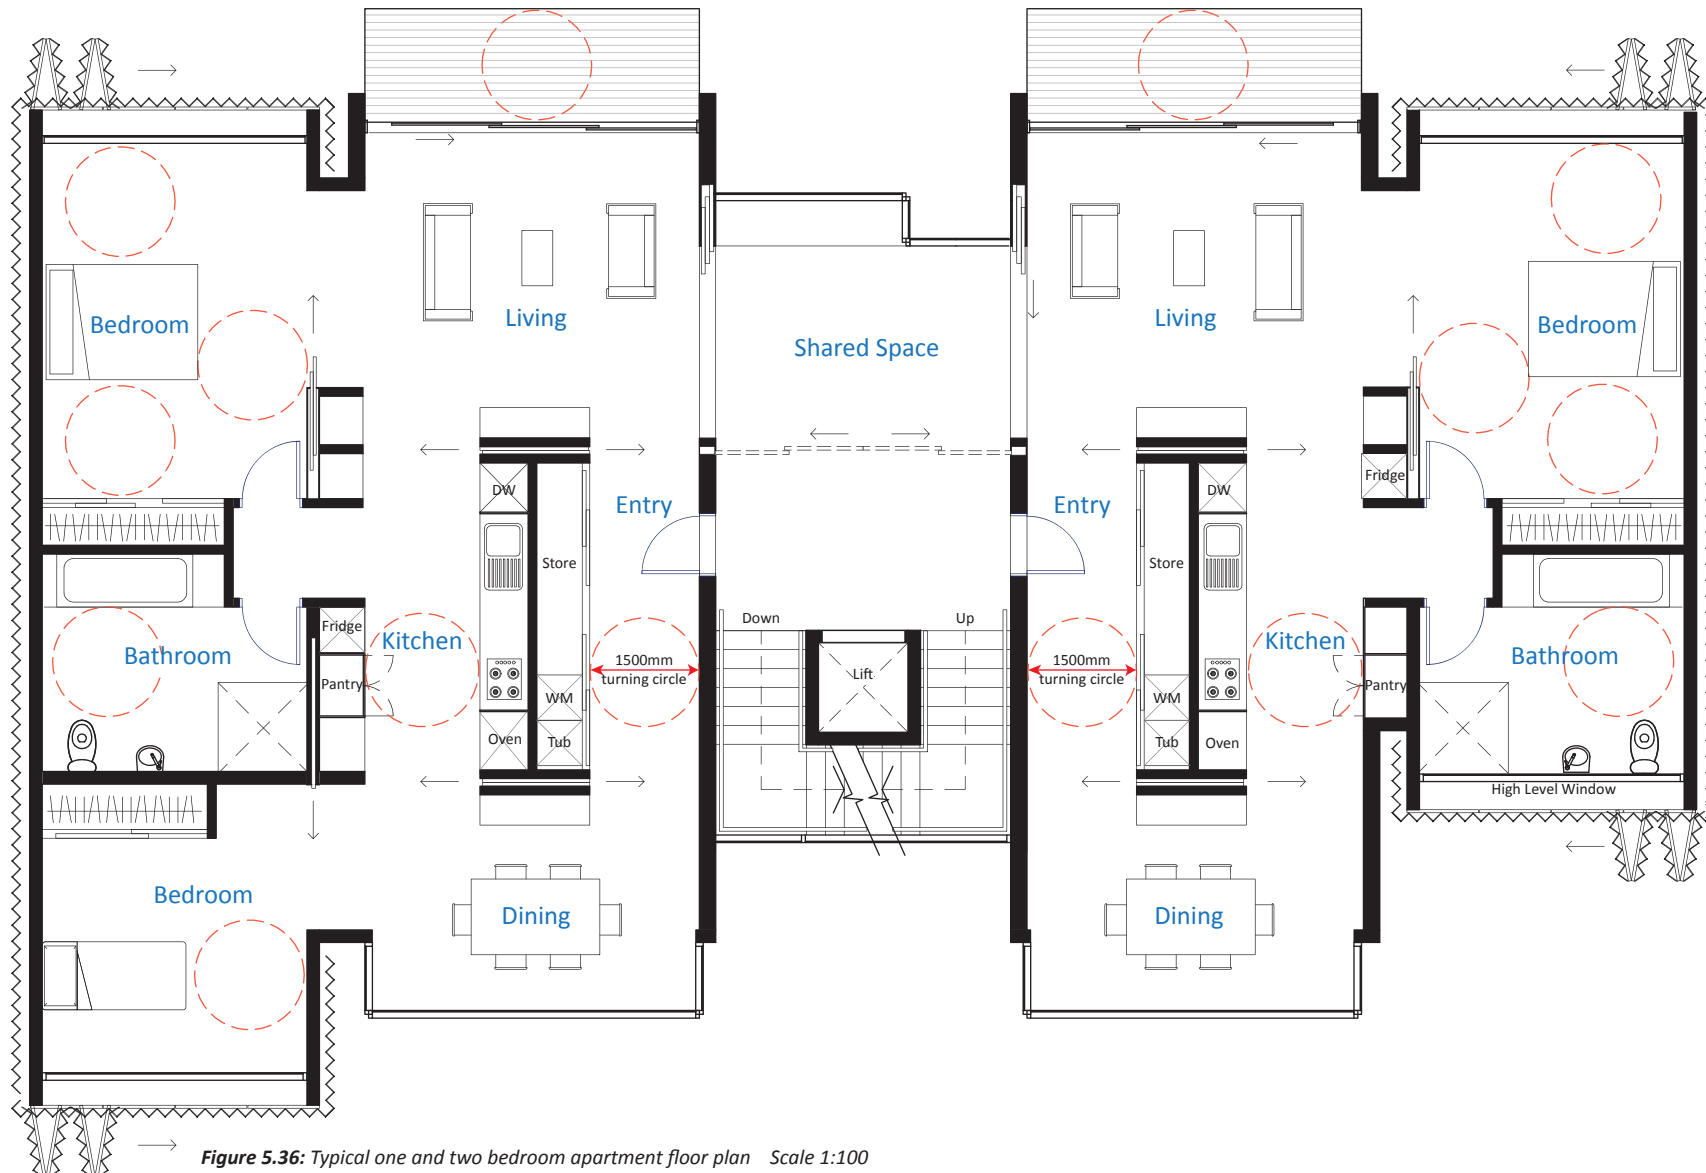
Typical one and two bedroom apartment floor plan Scale 1:100
